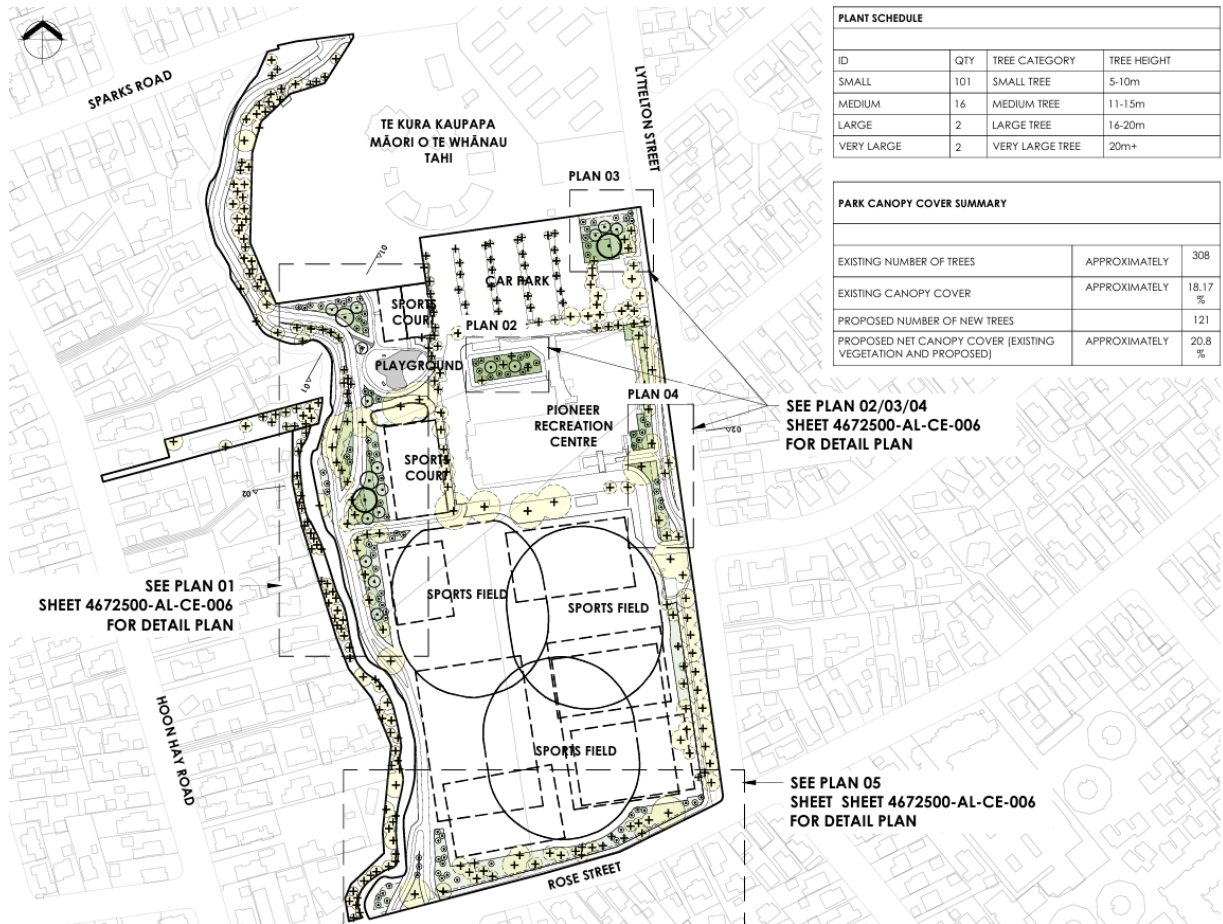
Proposed Centennial Park Tree Planting Plan overview
